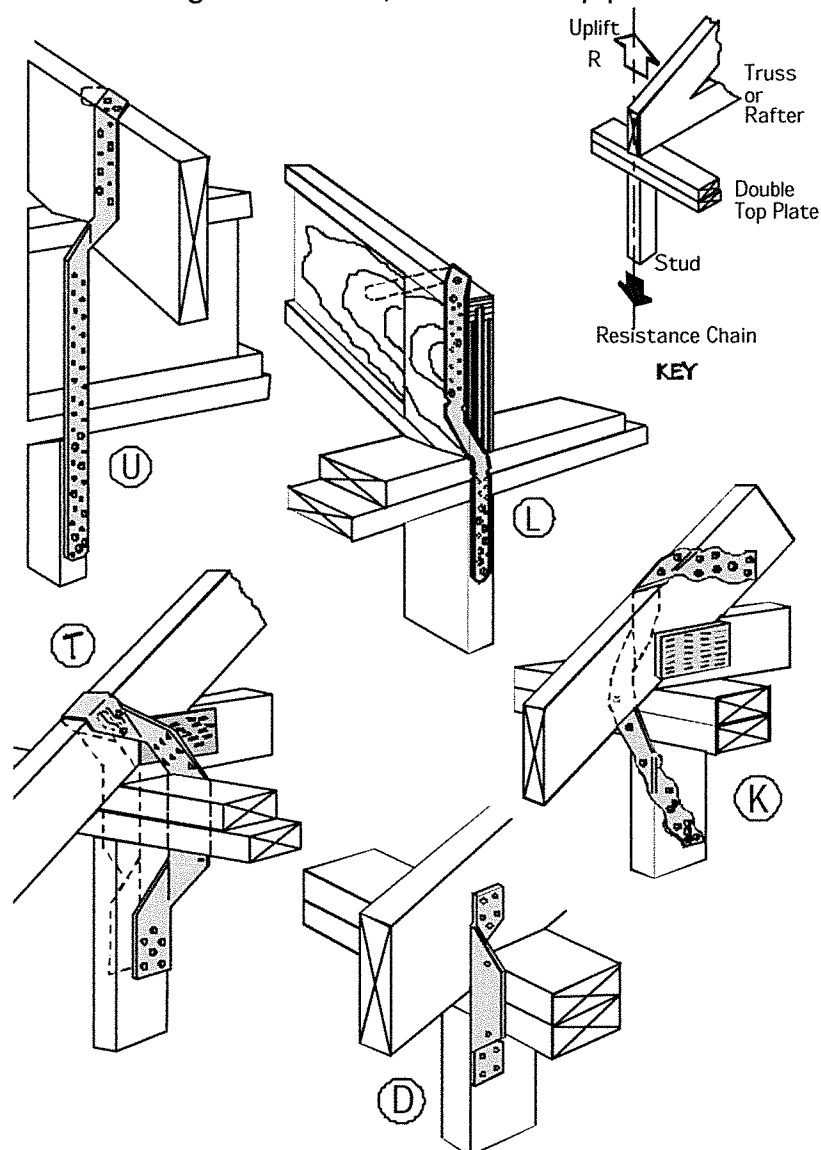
Roof and Stud Framing Alignment-Metal Connector Options
